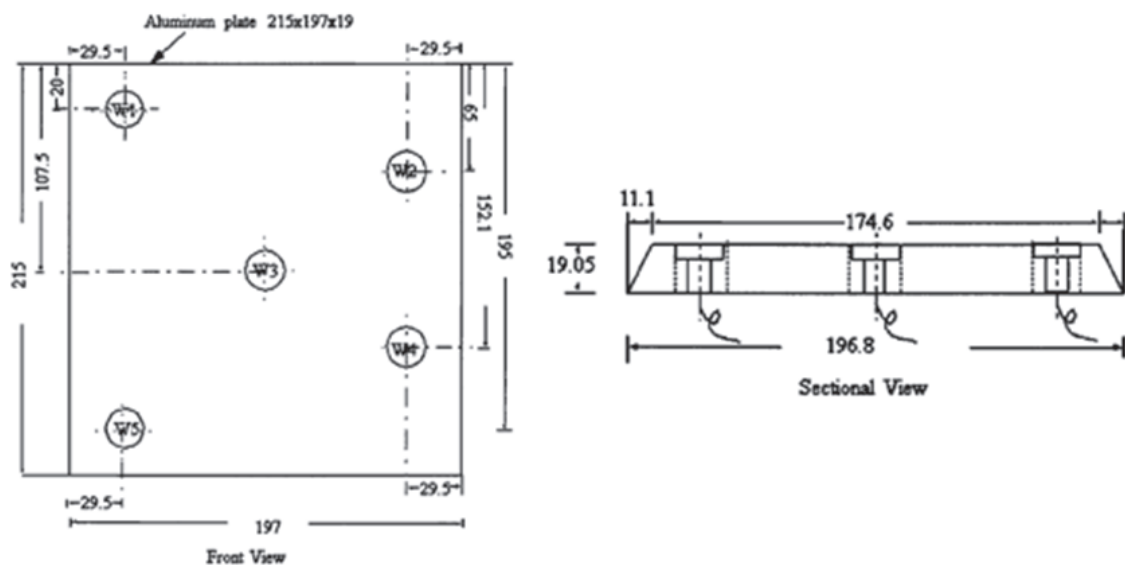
Location of Transducers on Retaining Wall (Hanna and Khoury 2005).
